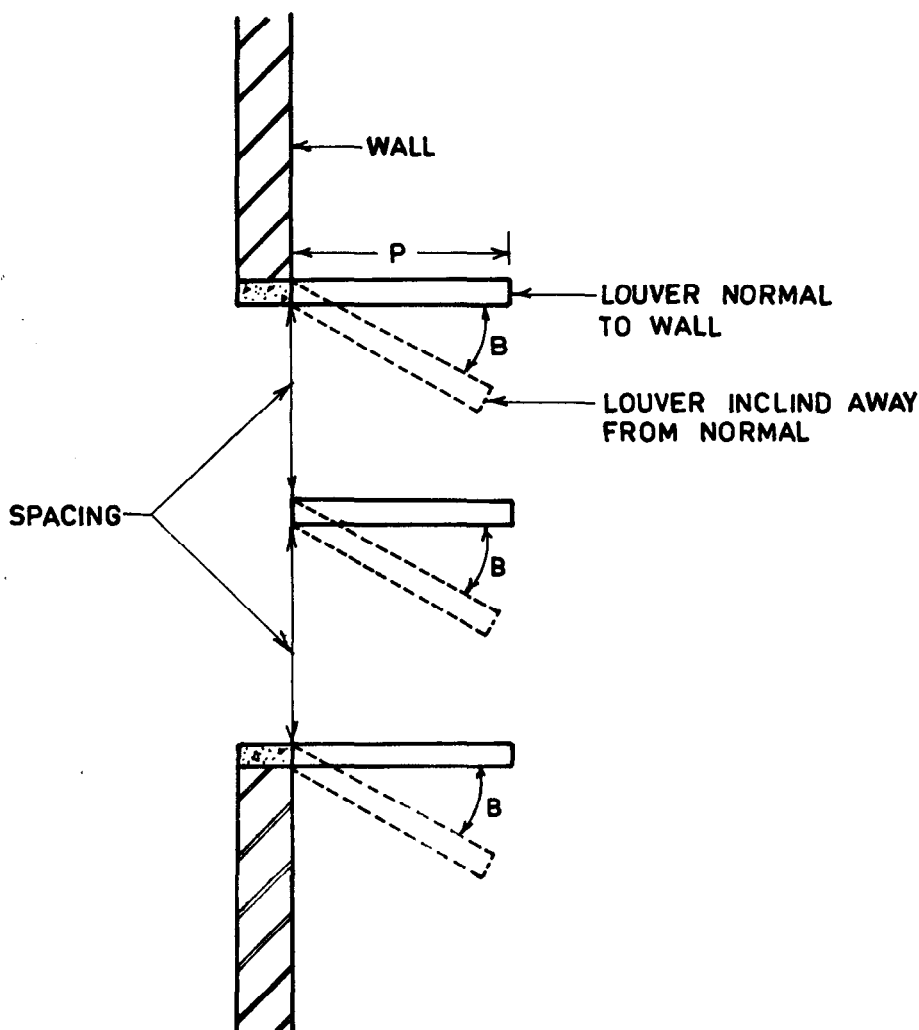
TYPICAL PLAN OF LOUVER SHOWING THE OUTWARD PROJECTION AND ITS INCLINATION
